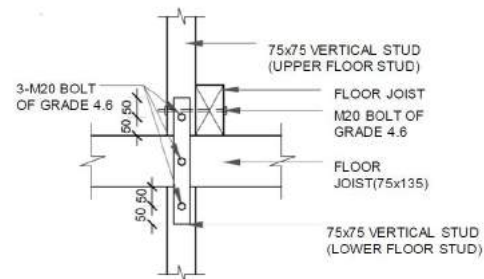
Connection stud and floor (DUDBC, 2017, p. 169)
